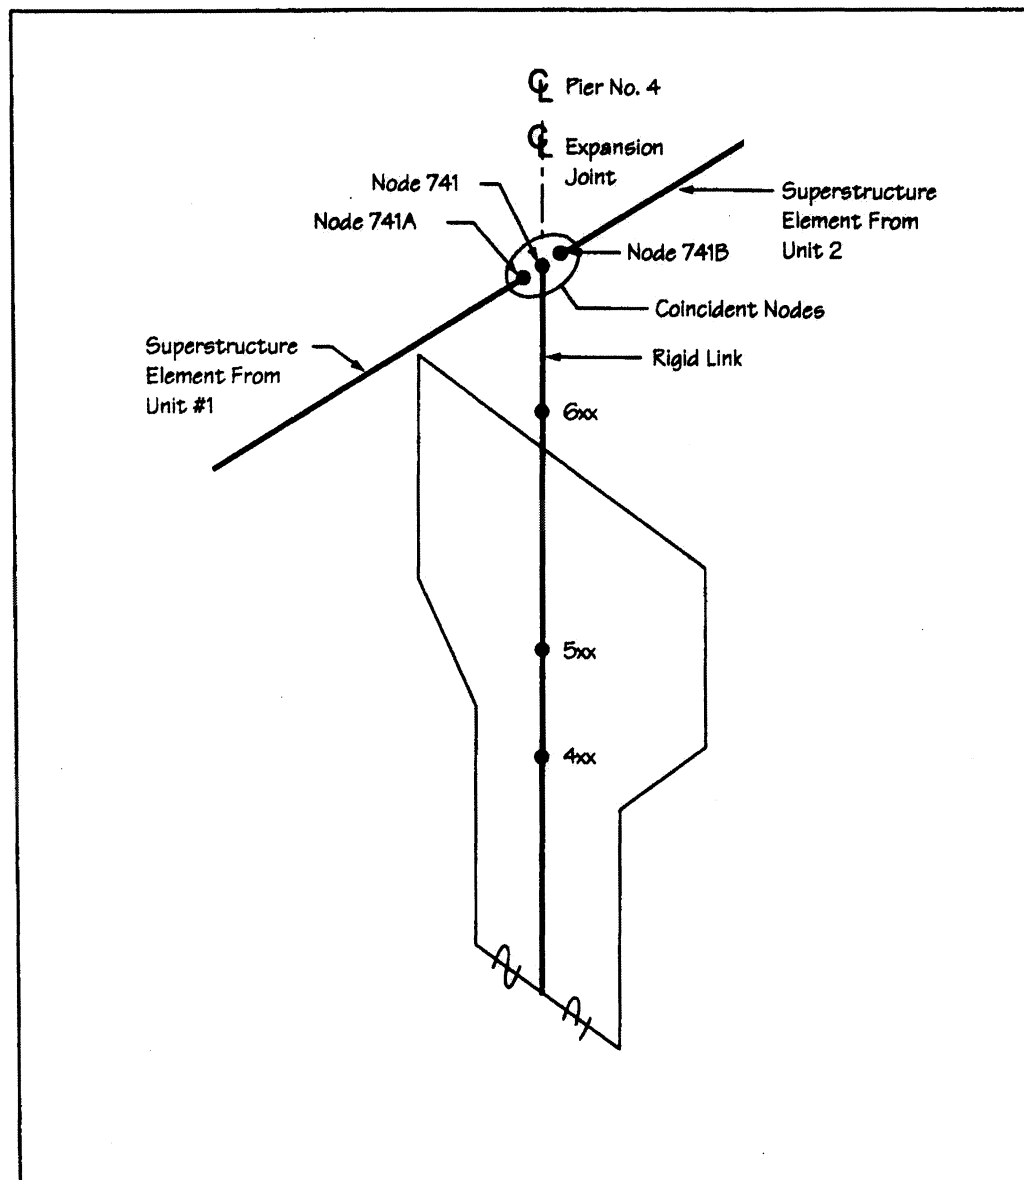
Bridge No. 5 – Details of Pier No. 4 Expansion Joint
